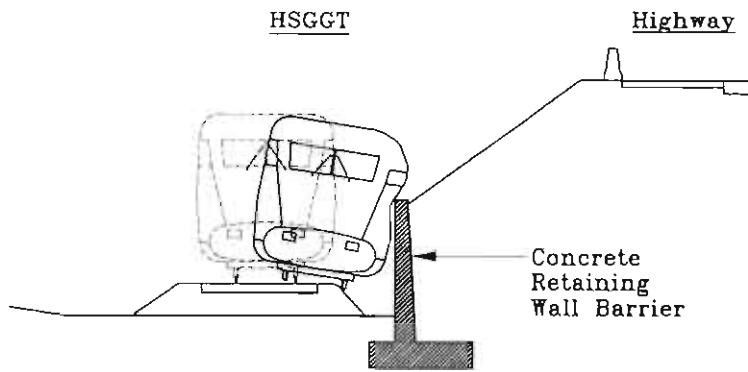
COMBINATION BARRIER - RETAINING WALL
